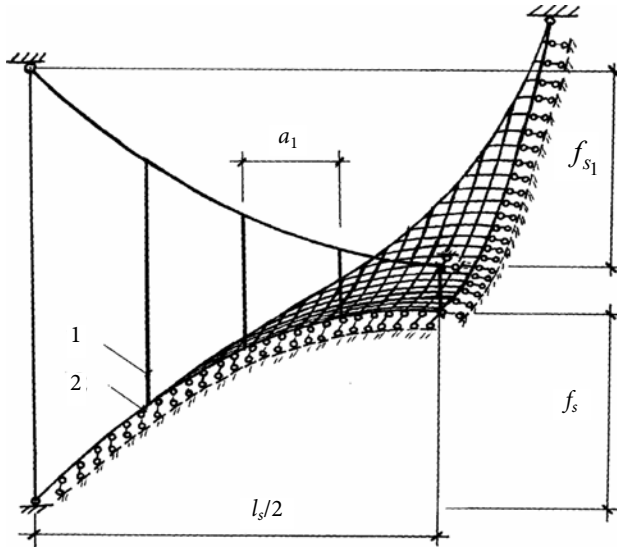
Design scheme of cable roof: 1 – cable truss; 2 – cable net;  $f_{s1}$  – initial deflection of cable truss top chord;  $f_s$  – initial deflection of main stressing cable;  $a_1$  – distance between the support points of tee-bars
